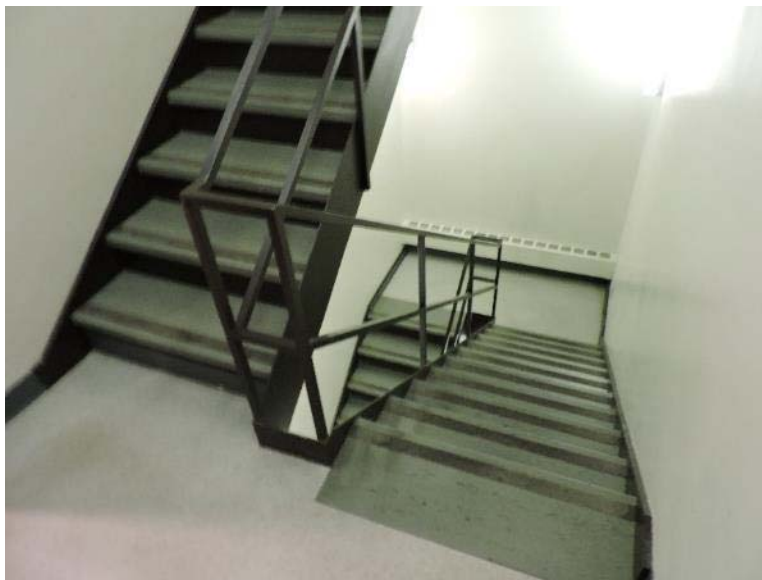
Figure 6 Stairs do not have code compliant guardrails.
